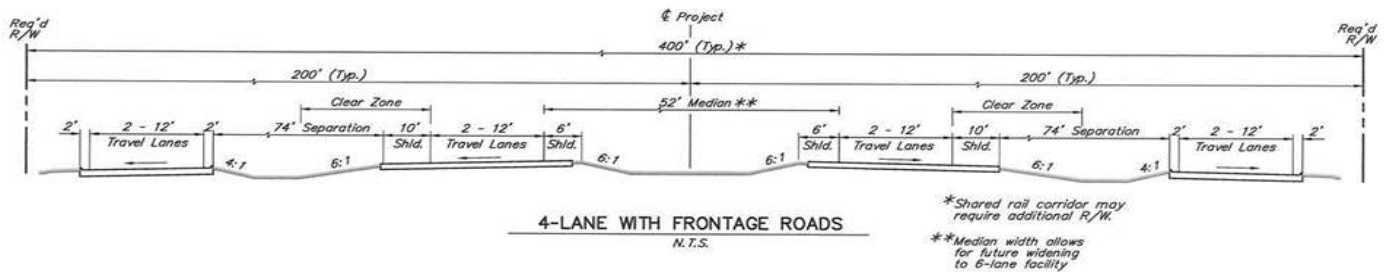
Proposed Typical Section of 4-Lane Highway with provisions for Frontage Roads (Source: Baton Rouge Loop Tier I EIS)
